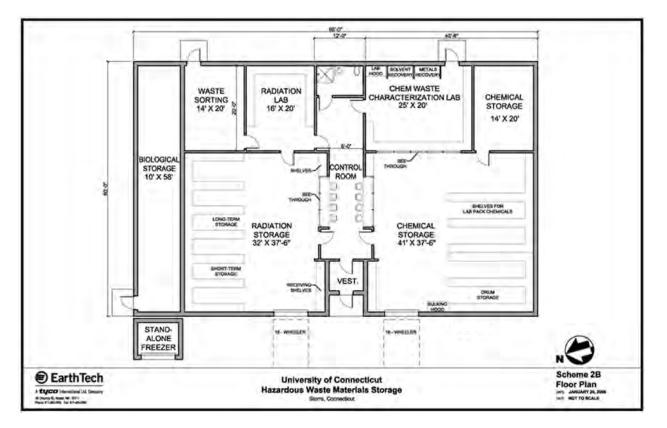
Typical Interior Floor Plan of the Proposed MAA
